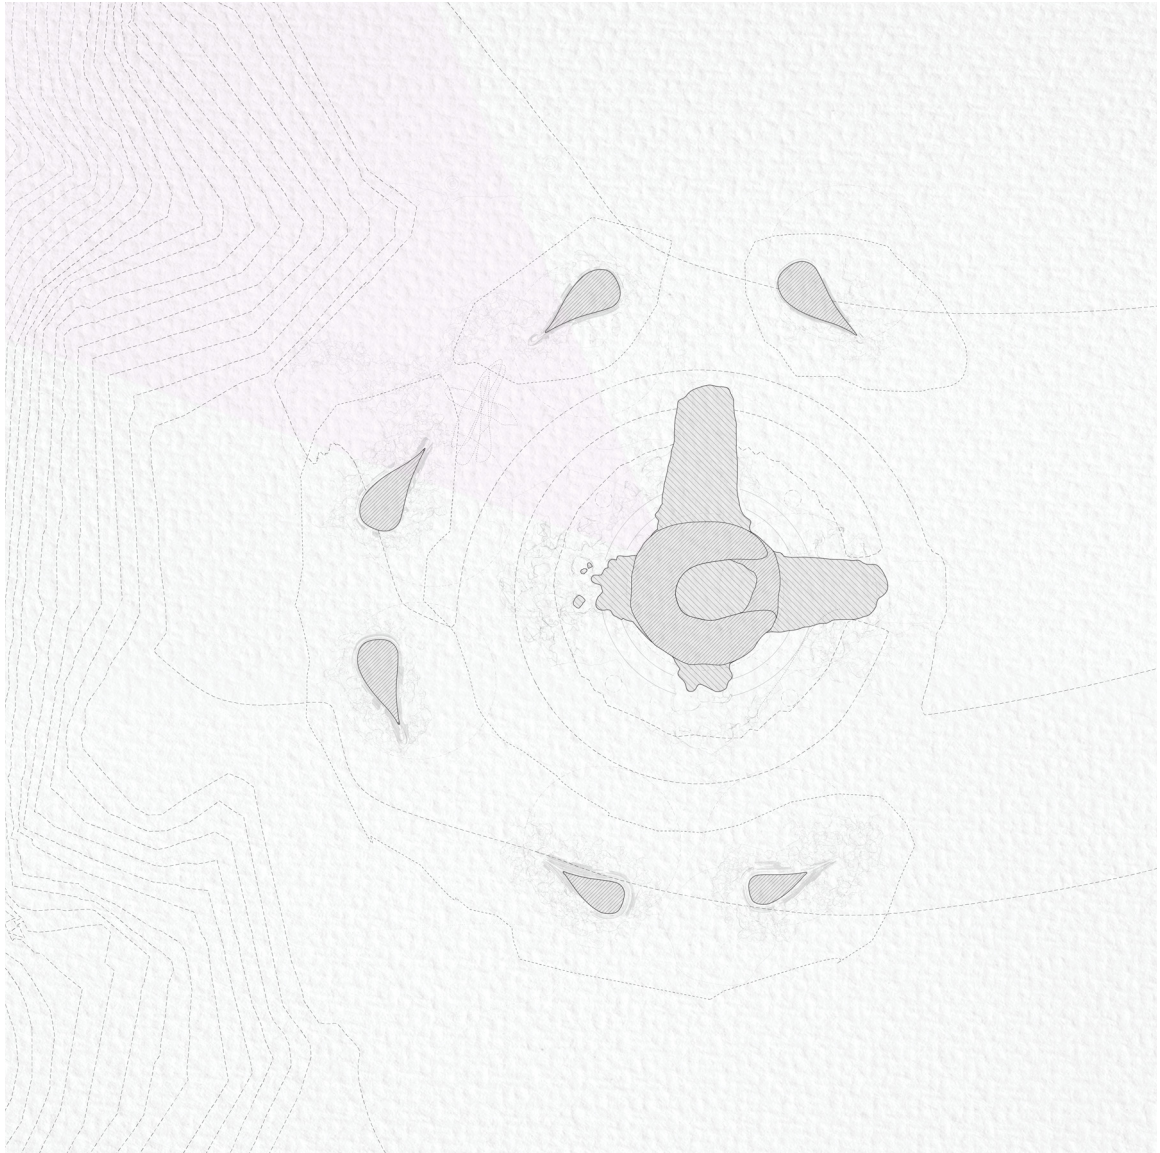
Floor Plan of Pavillion A. Base layers from: (GIS Medicine Hat, 2010).
